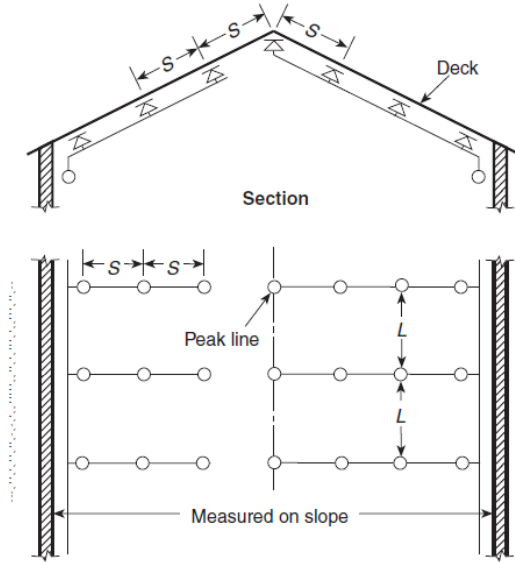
(a) Sprinklers Under Pitched Roof with Sprinkler Directly Under Peak; Branch Lines Run Up Slopes.
